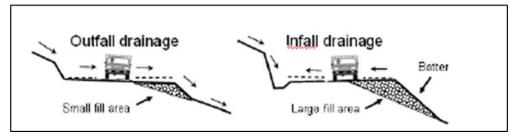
Outfall Drainage and In Fall Drainage - Steep Slope - Cross-Section
